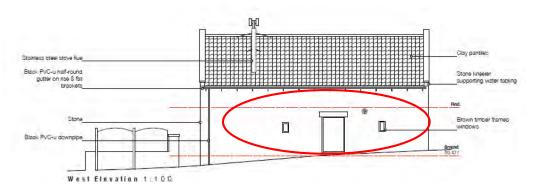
Current rear elevation of the house with no means of escape and no tolerance for aiding natural light.
